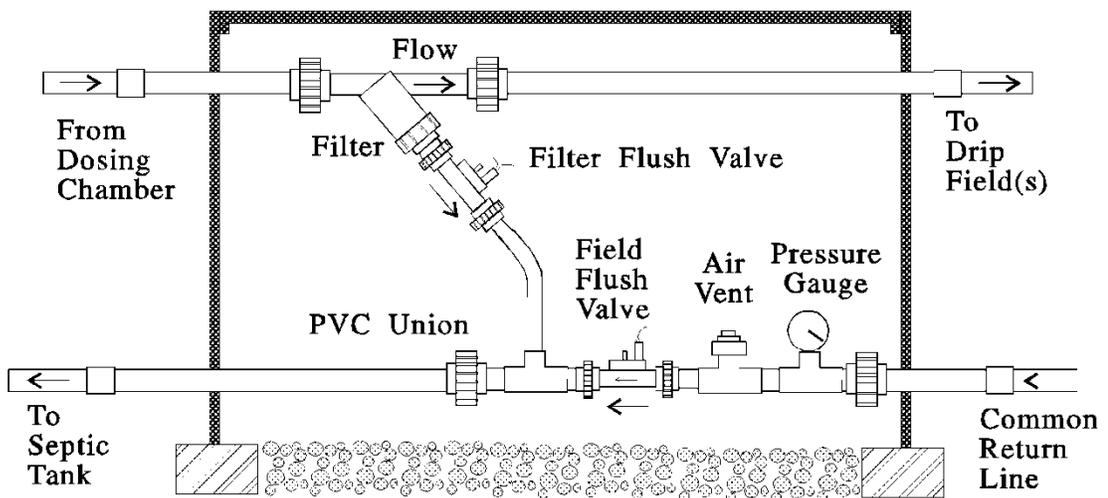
Cross-Sectional View of Typical Filter, Valve, and Meter Assembly
